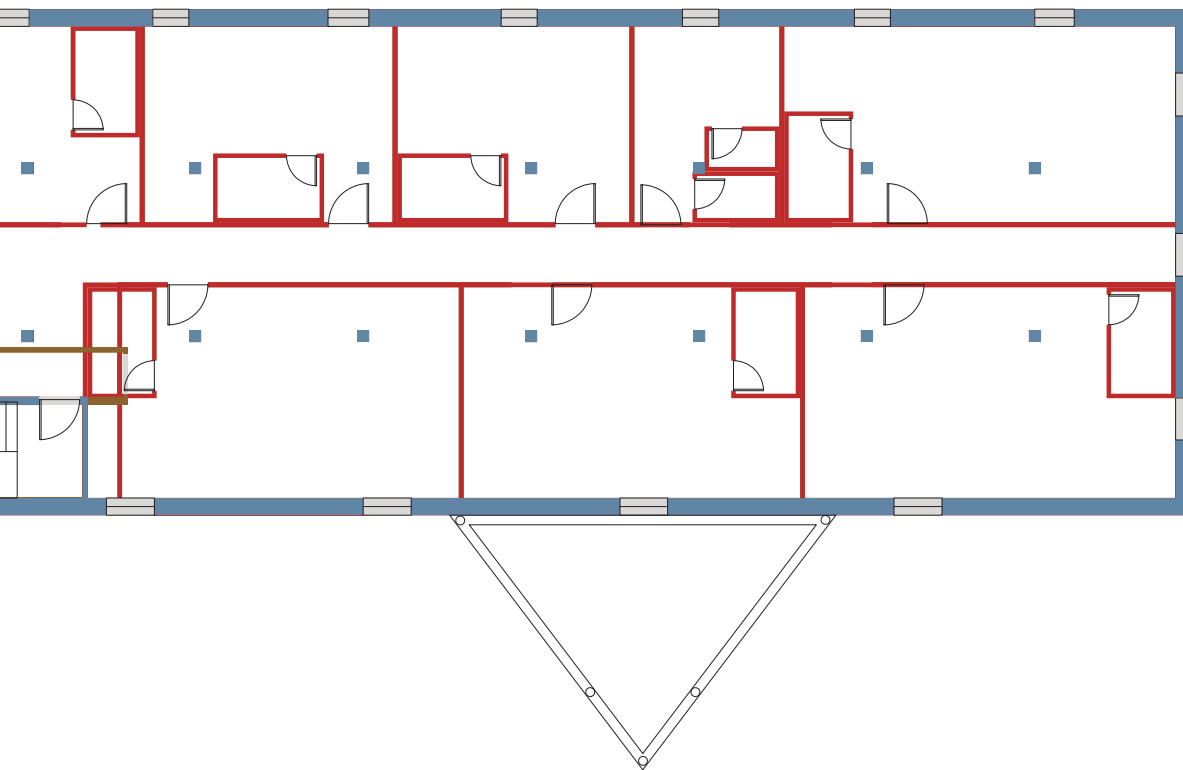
Existing Structure, New Structure, and Removed Structure Diagram of the 1st Floor
